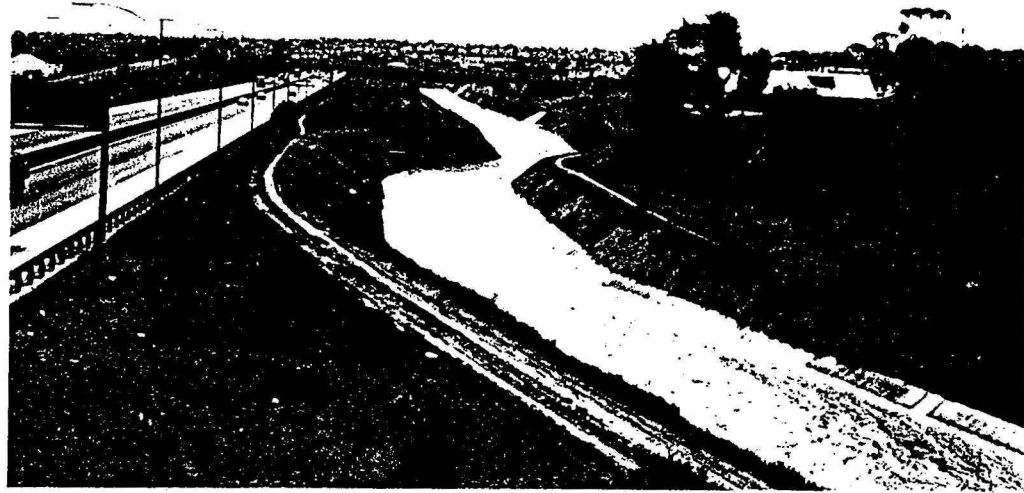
View looking upstream along the realigned channel between Dawson Street and Victoria Street Bridge. Note the double bend in the channel and the drop structure
